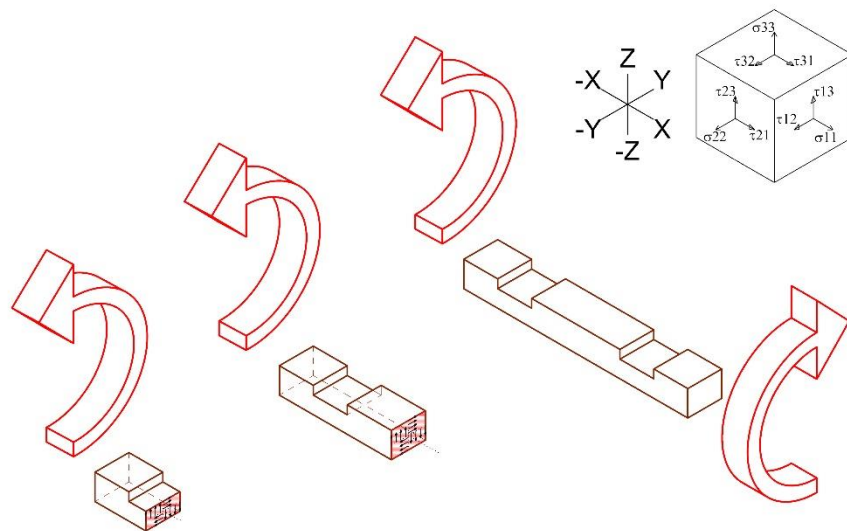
Cross Piece -Torsion: M_x on x axis
